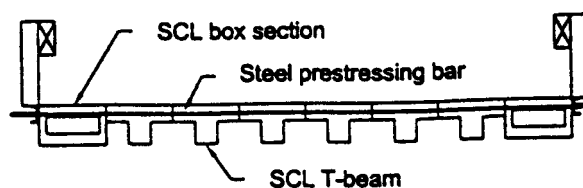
Typical configuration for a stress-laminated SCL T-beam bridge (not to scale).
